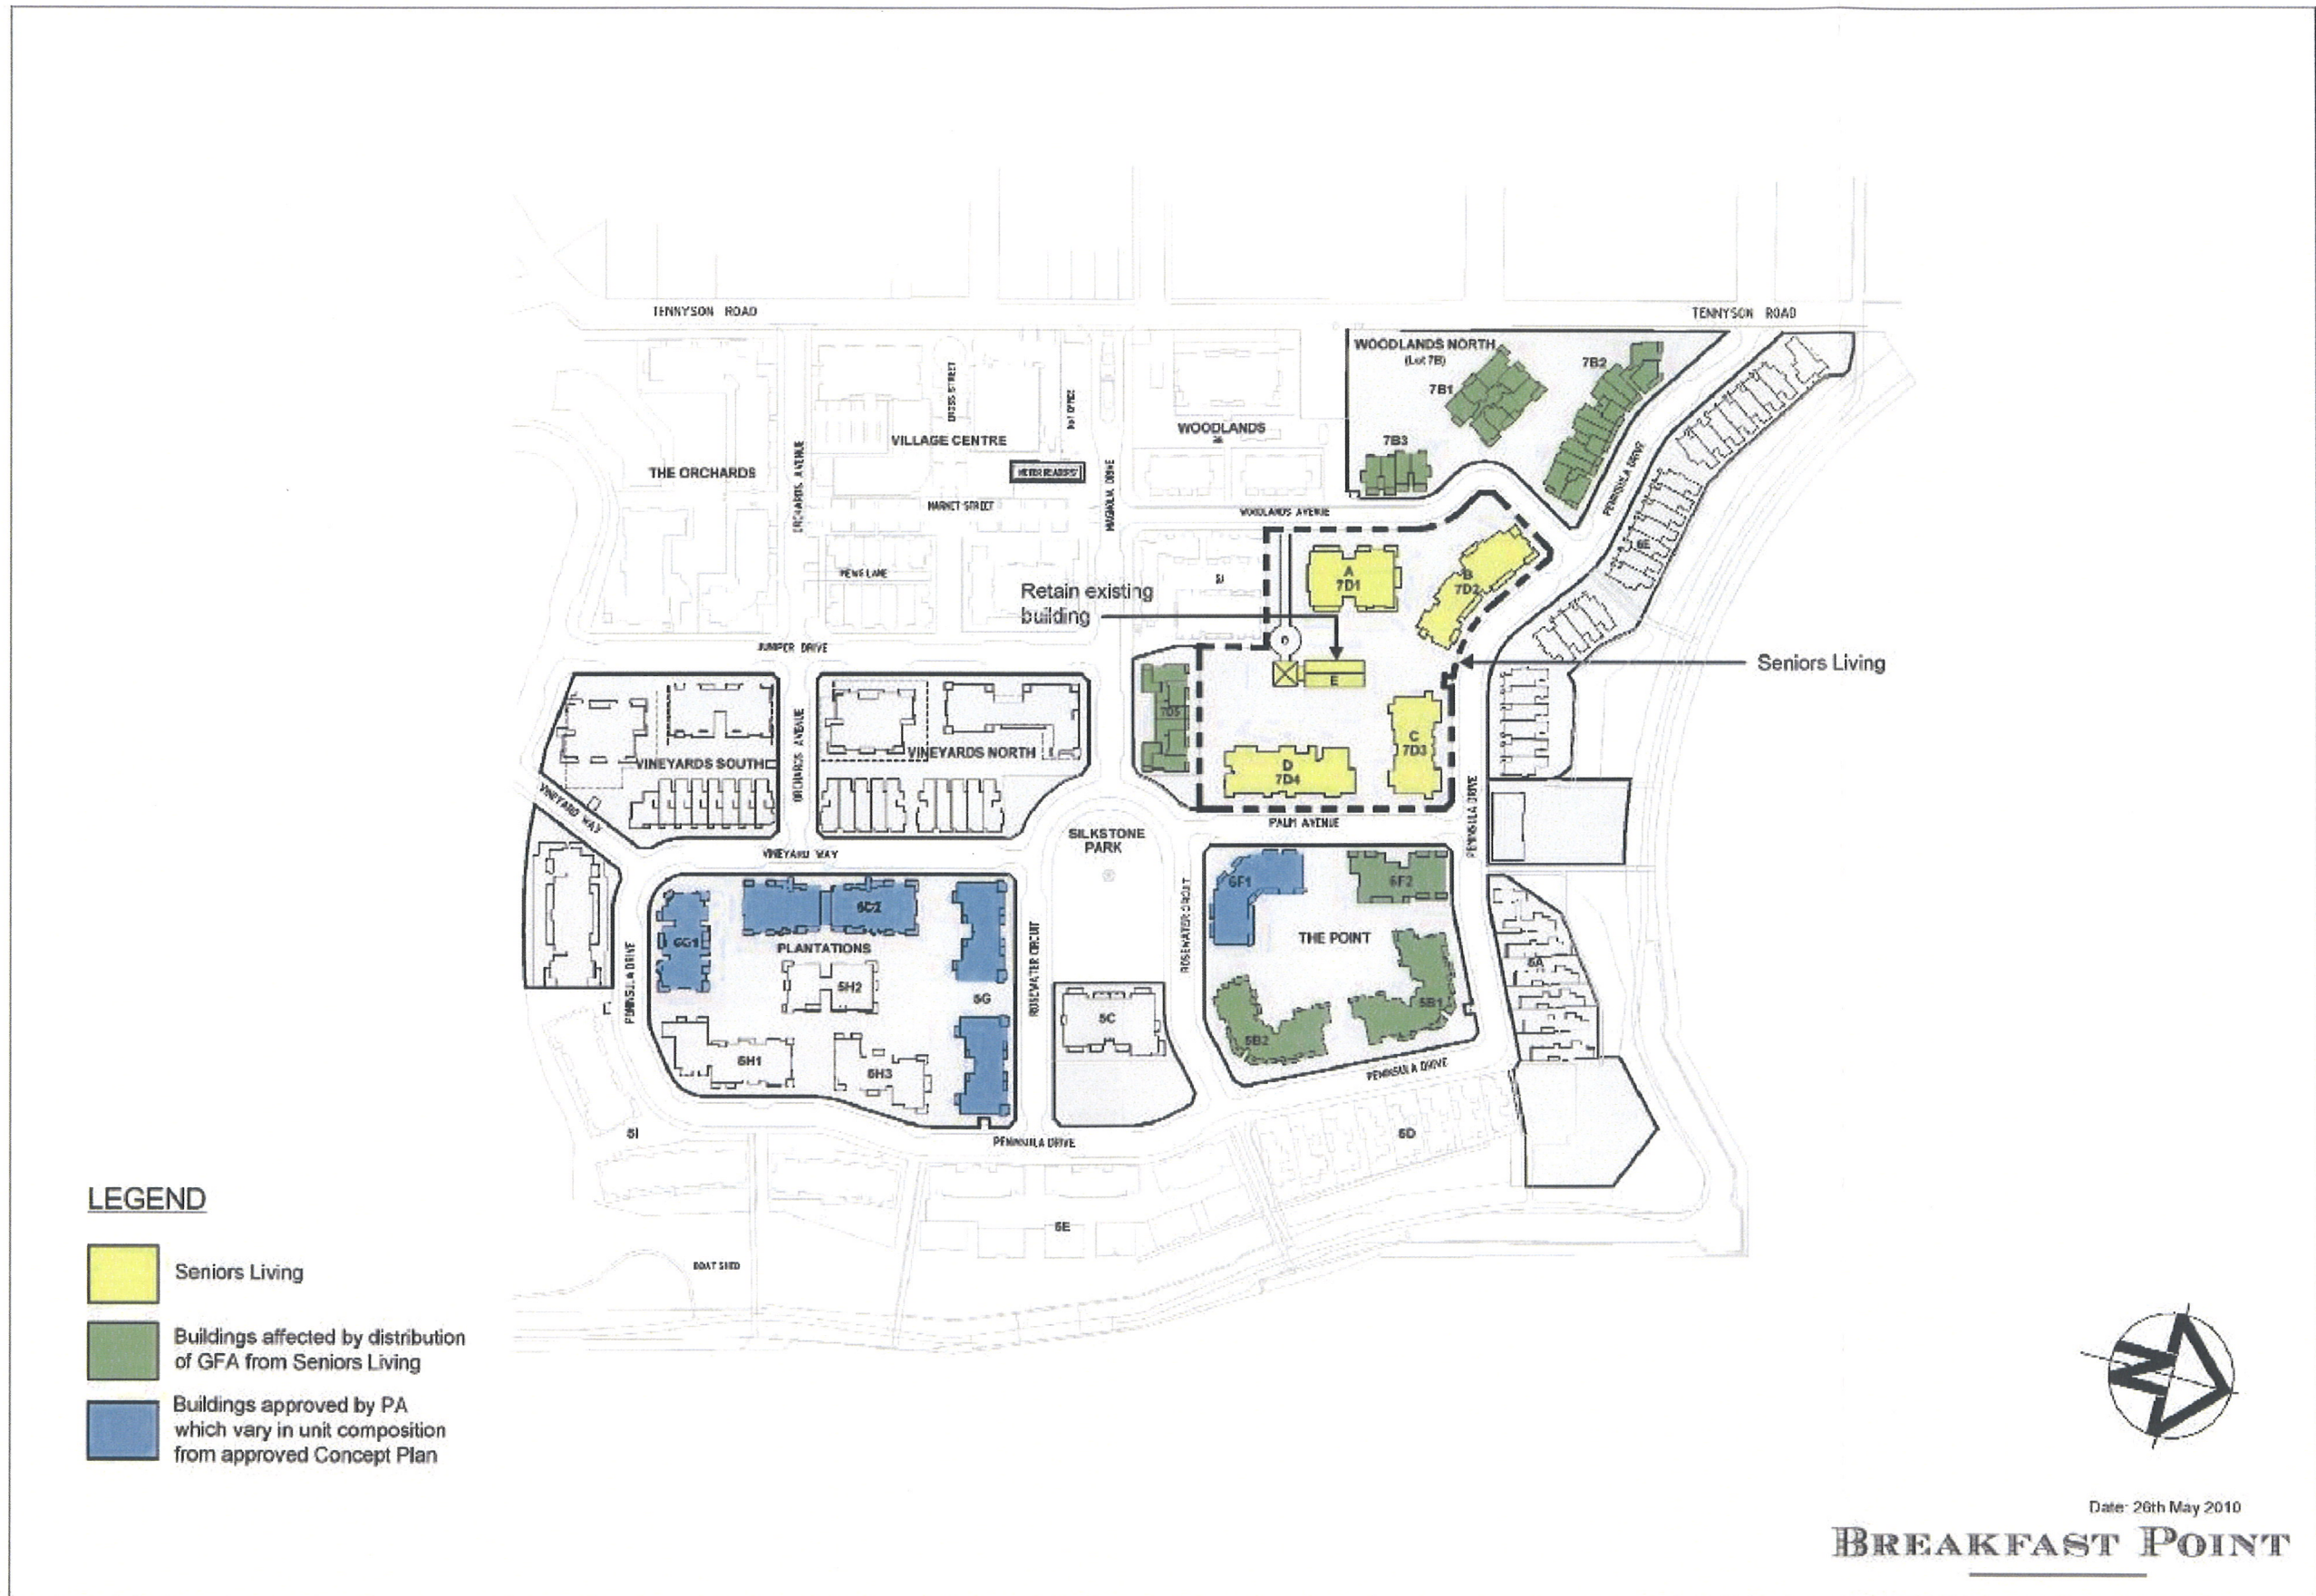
Breakfast Point Concept Plan 2005 Modifications
